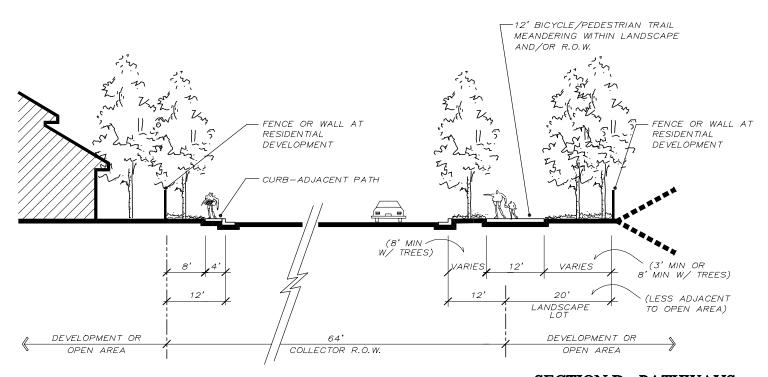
TRAIL SECTIONS B1 & B2
